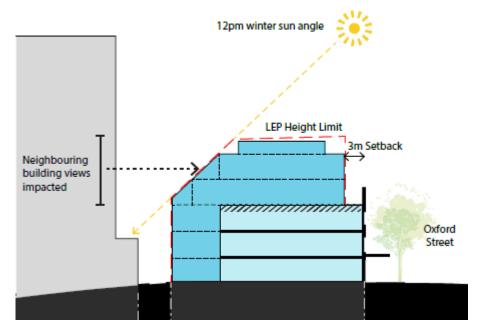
Typical indicative section illustrating acceptable view impact from vertical additions
